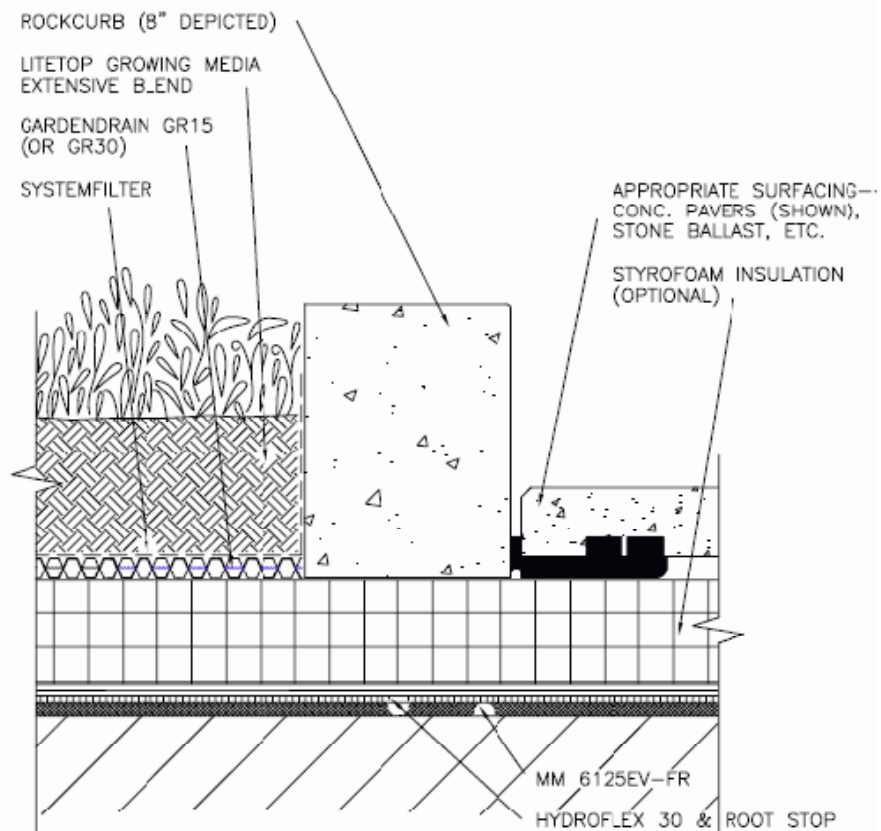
Detail of a Possible Transition Option for an Extensive Garden Roof Assembly
